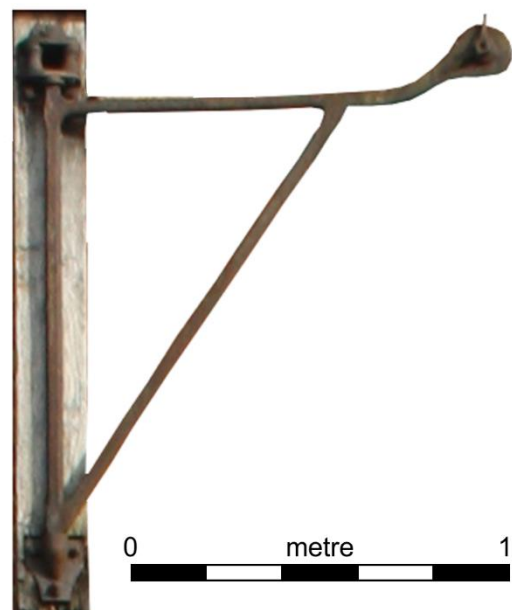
Surviving pulley hoist, west end of Building 1 (scale 1:20 approx.)
